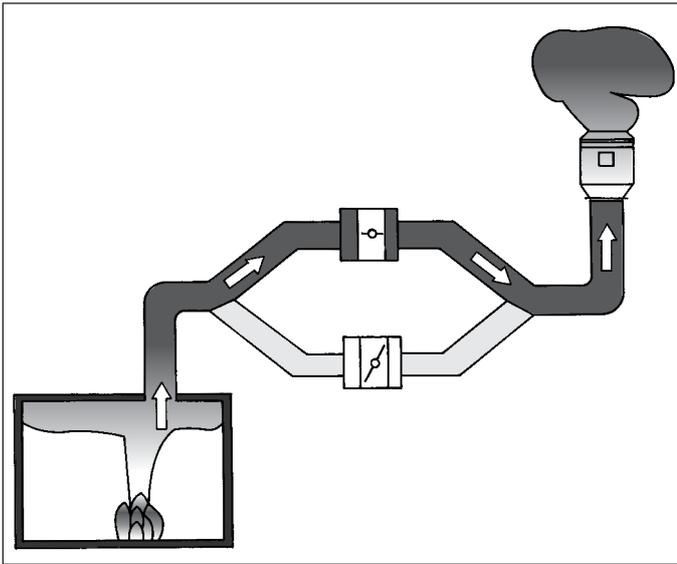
Fire damper and smoke exhaust damper in a bypass configuration
